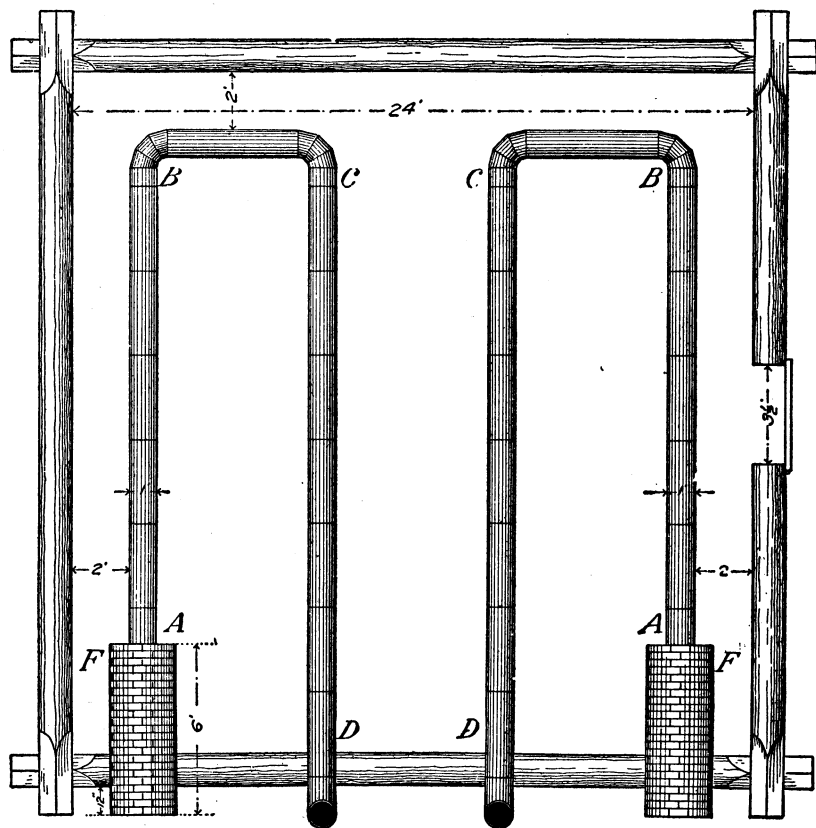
Floor plan of furnaces and flues in a flue-curing tobacco barn: A, A, Fire joints at furnaces (F, F); B, B, and C, C, flue elbows; D, D, points (1 to 2 feet higher than at A, A) where flues pass outside to smokestacks. Instead of elbows at C, C, a T-joint would lead to a single stack instead of two (fig. 5).
